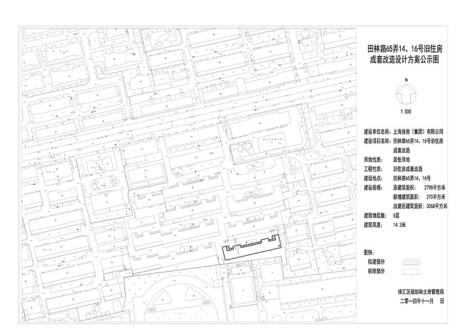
Proposed Renewal Plan for Tianlin Second Village
